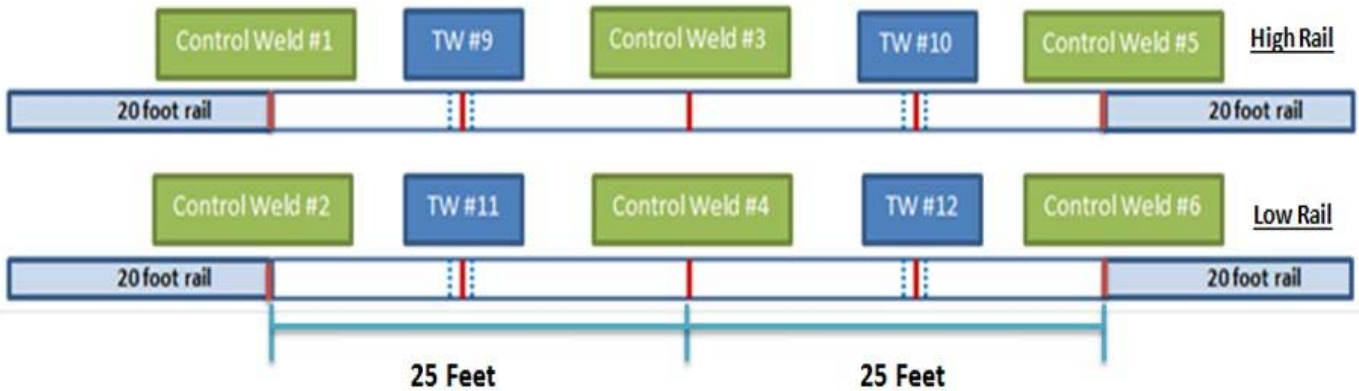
A diagram showing the installation locations of the 4 induction treated and 6 control welds tested at FAST. TW represents the treated welds
